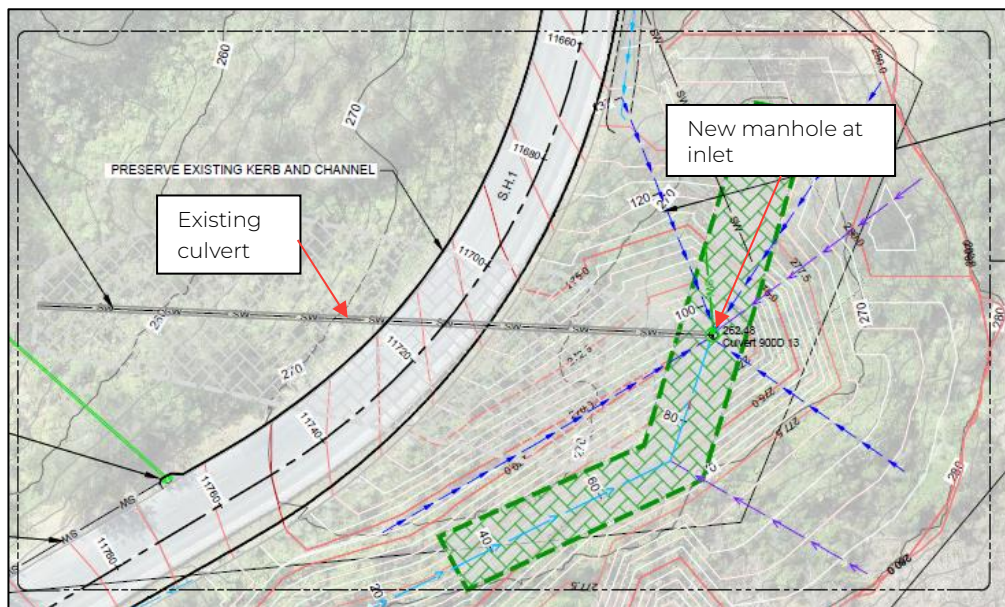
Site A existing culvert shown in grey and new manhole extension in green.
